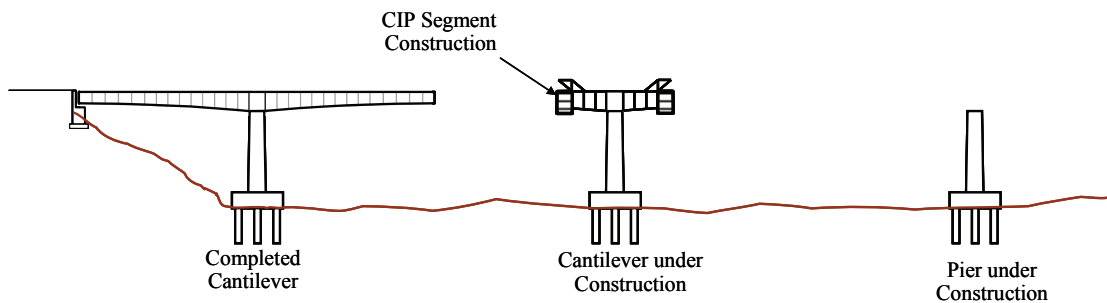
Schematic of Balanced Cantilever Construction with CIP Segments
